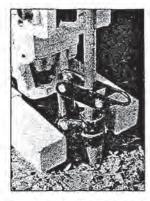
The DT21 Rod Clamp Assembly holds the inner rod string while adding or removing 1.0-inch rods.
